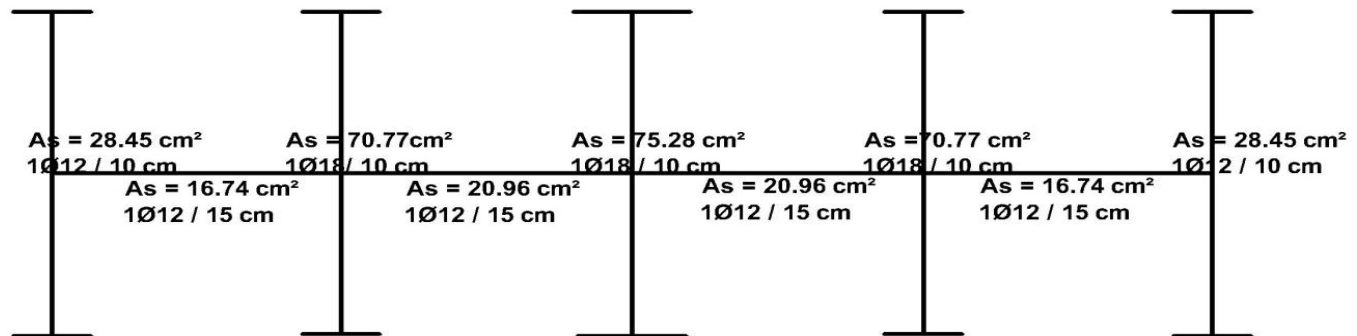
column strip reinforcement for frame 1 in slab1 X-dir
